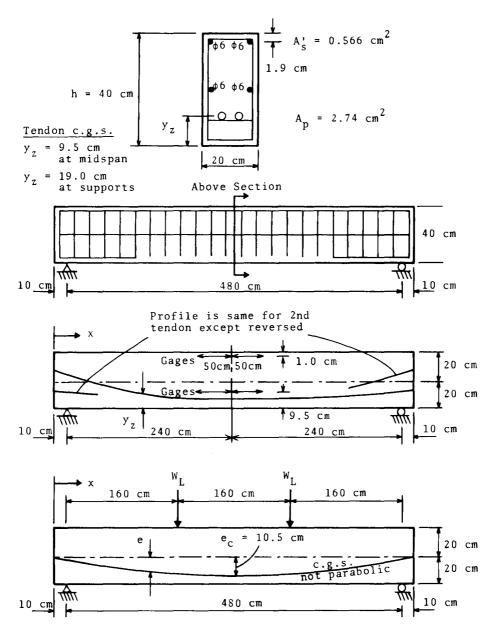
Beam 2 [unbonded prestressed, draped tendons (not parabolic)]
